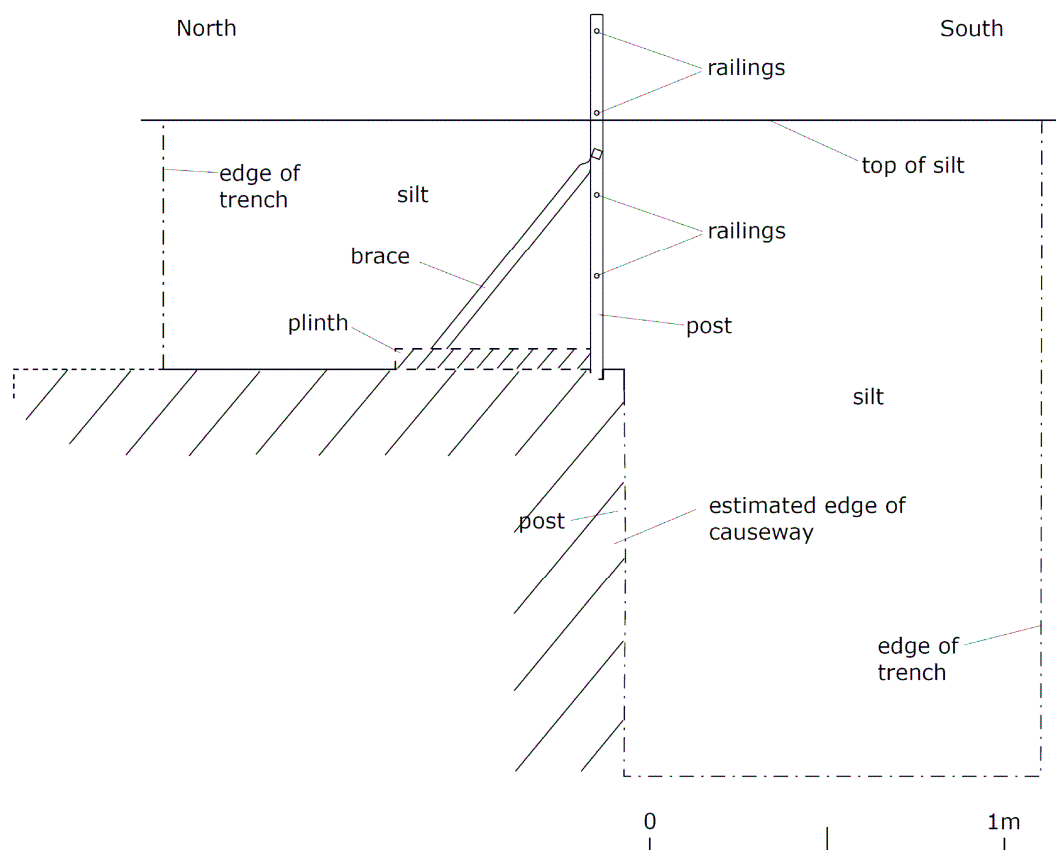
Profile through trench showing excavated depth of trench, edge of causeway and layout of fence and brace
